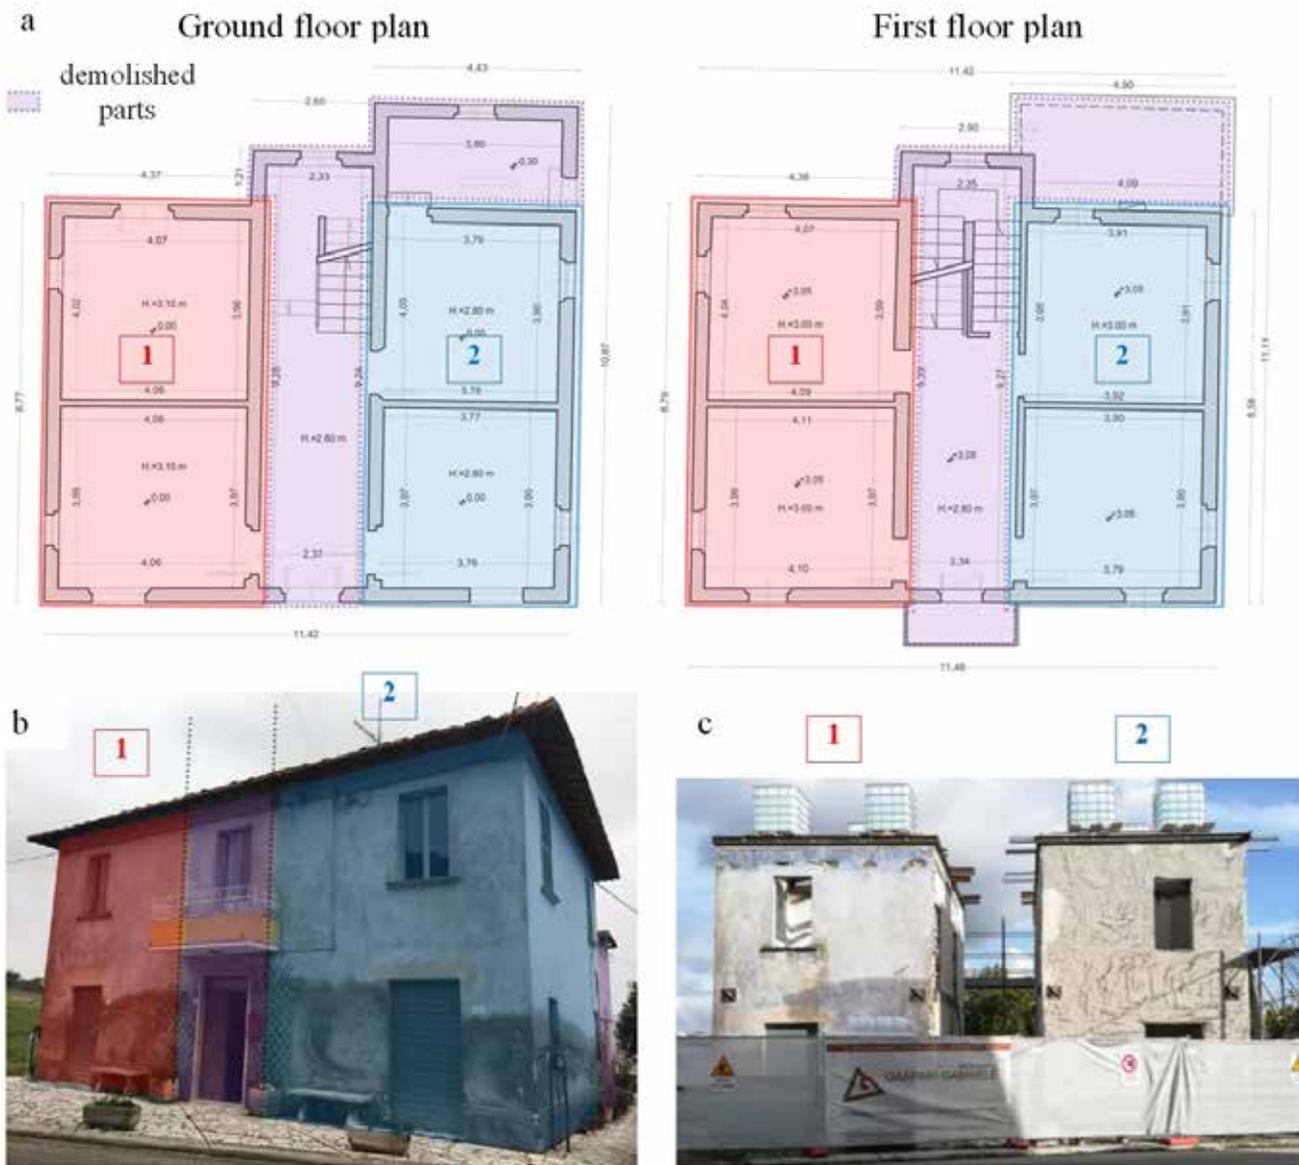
(a) Ground Floor and First Floor of the building; (b) original building; (c) buildings created for the execution of the tests.
